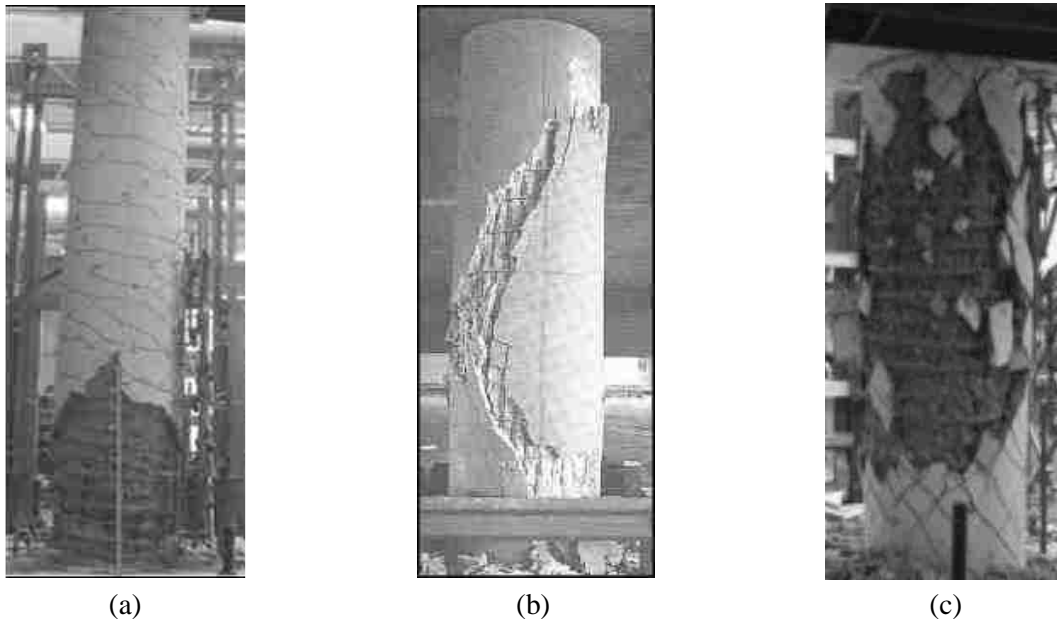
Failure modes of bridge columns: (a) flexural failure (Prakash et al. 2010), (b) shear failure (Priestley et al. 1996), and (c) torsional failure (Belarbi et al. 2009).
